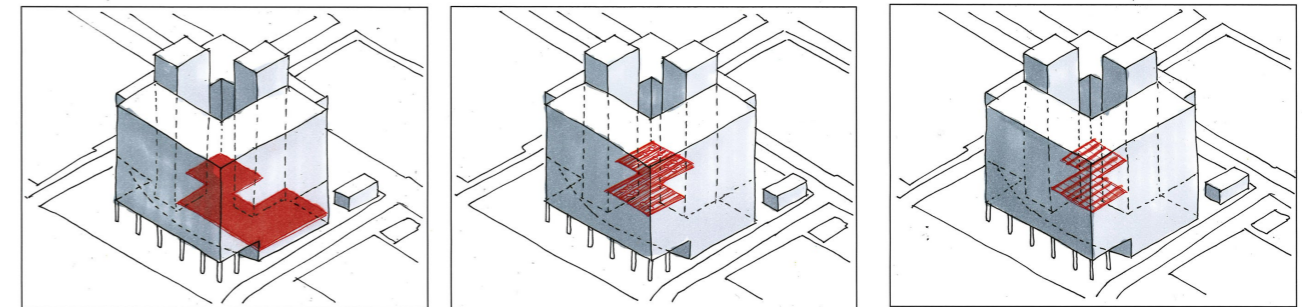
Ground floor interventions: removing first floor, removing current atrium, adding a new atrium (Lars Haga, 2026)
